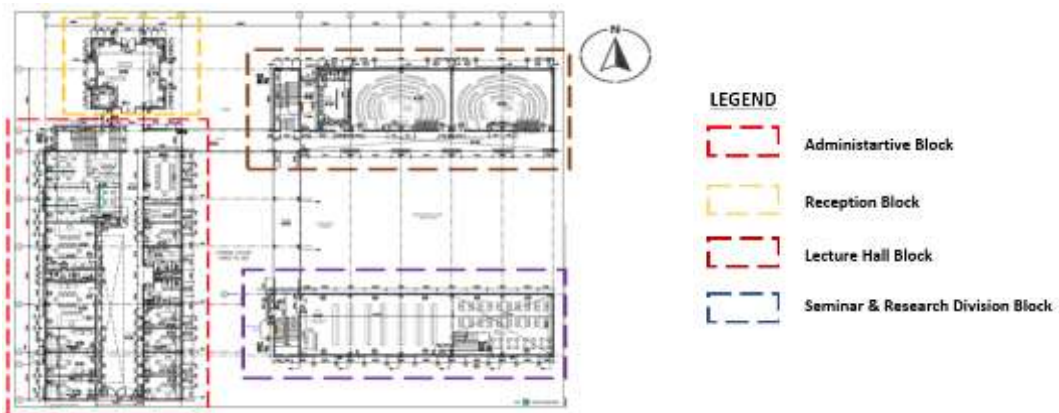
Ground floor Plan of Frank & Debbie Islam management complex, A.M.U.
